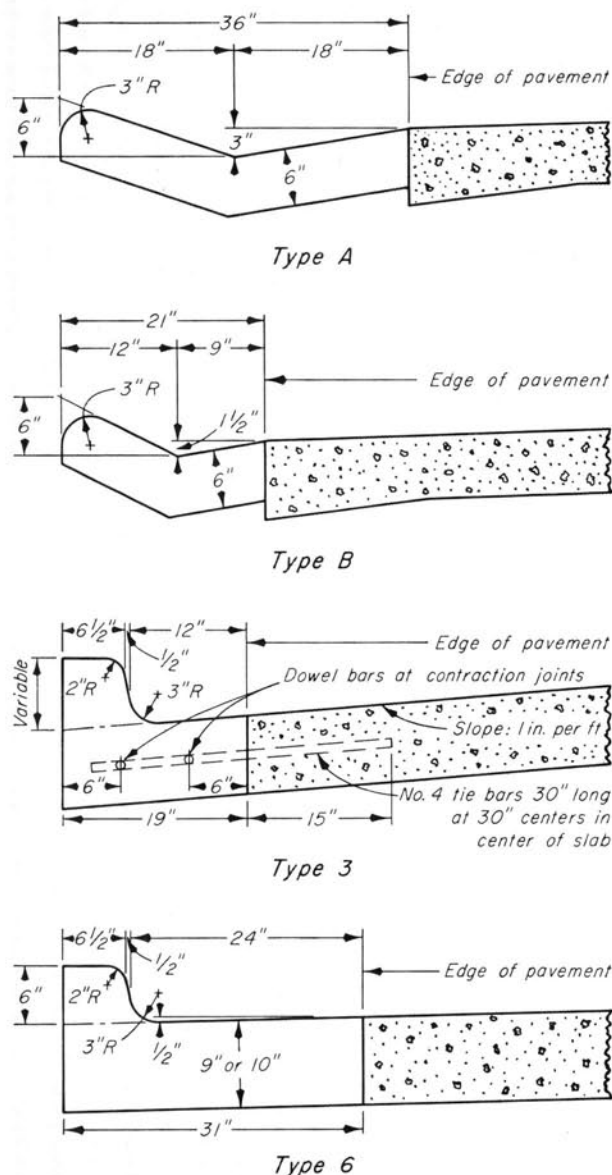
Standard Gutter Sections, Illinois Division of Highways
